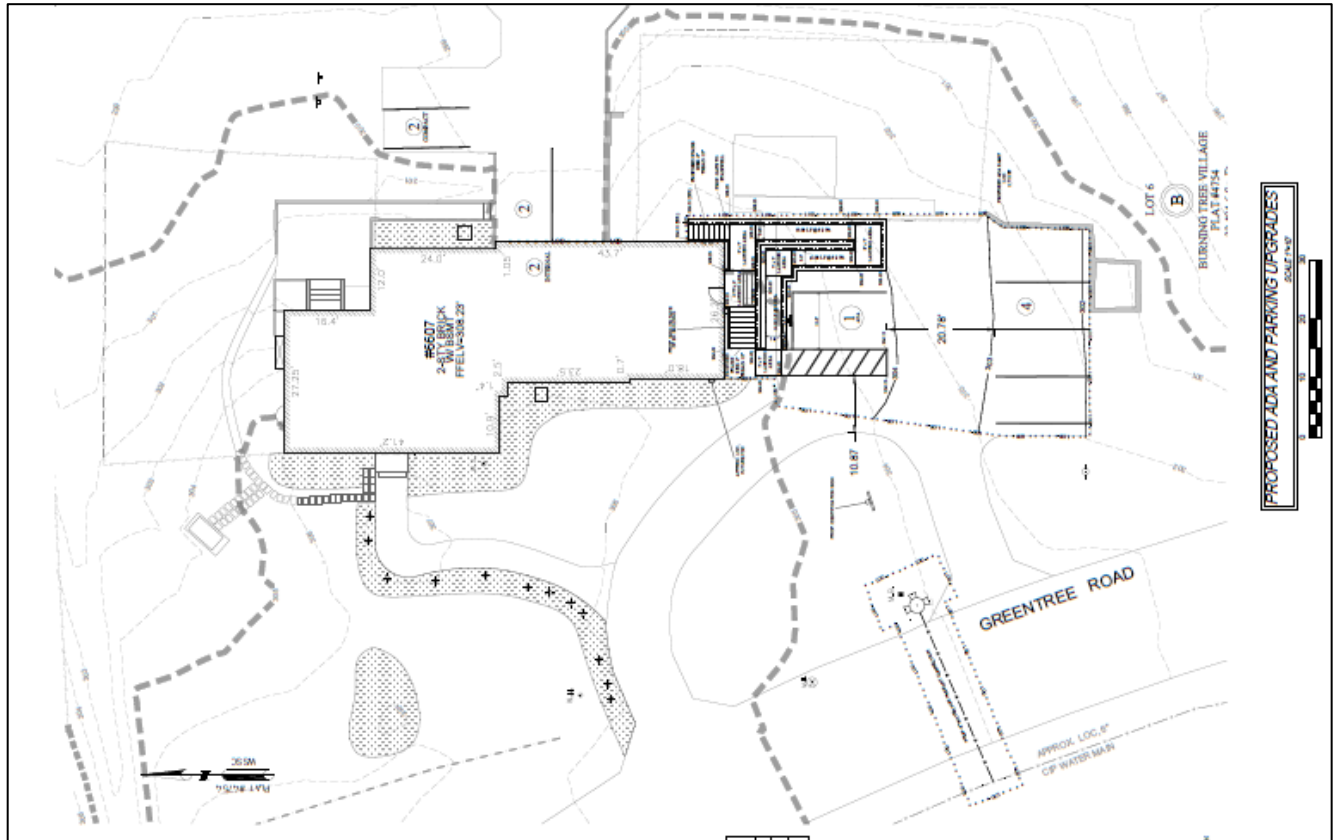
ADA Accessibility Upgrades and On-site Parking Exhibit
